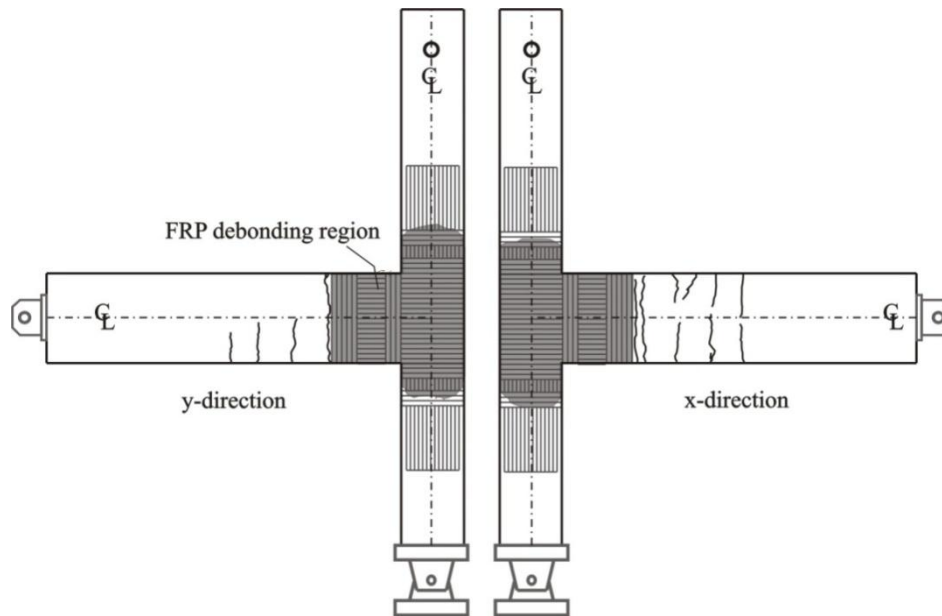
Crack patterns at final stage for Specimen 3D2
